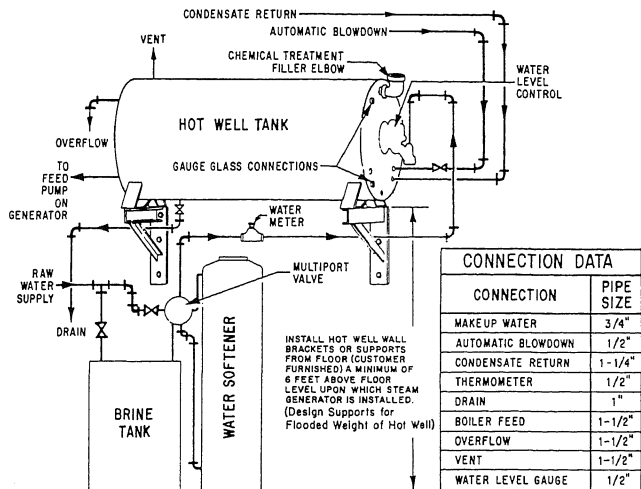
A typical installation of horizontal hot-well tank and connection data.
